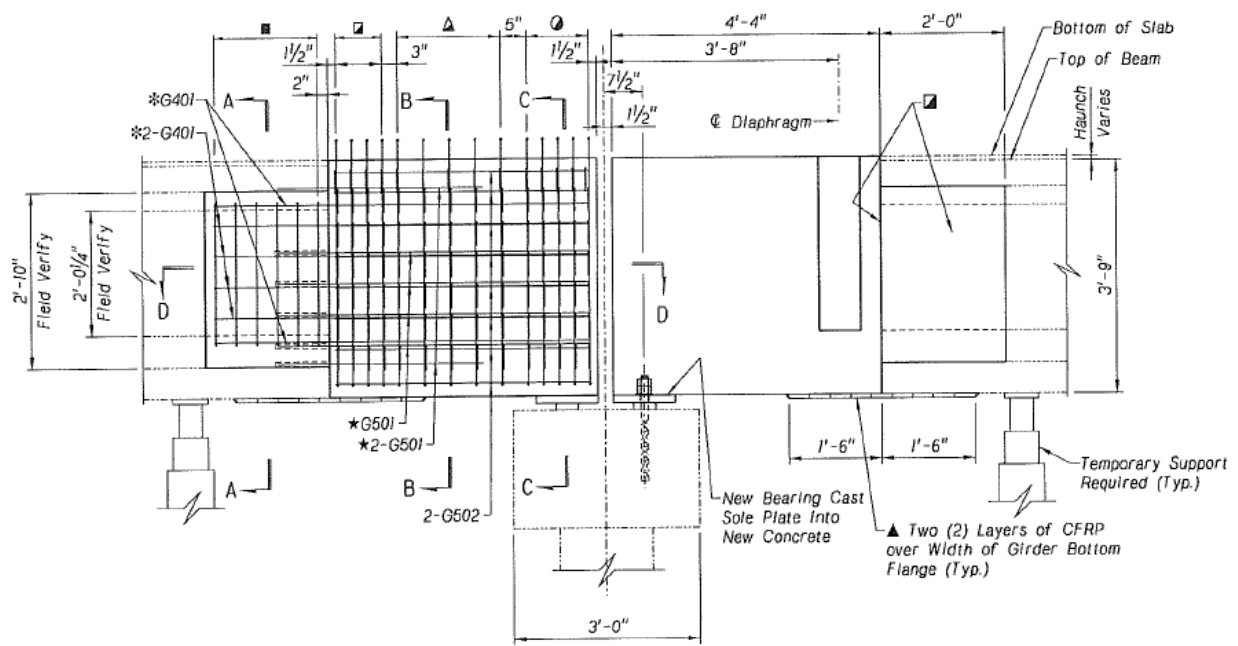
Detail of girder end encasement and CFRP layers on the 2015 repair works, from the repair documents of Kearney South Platte River Bridge, courtesy of NDOT
